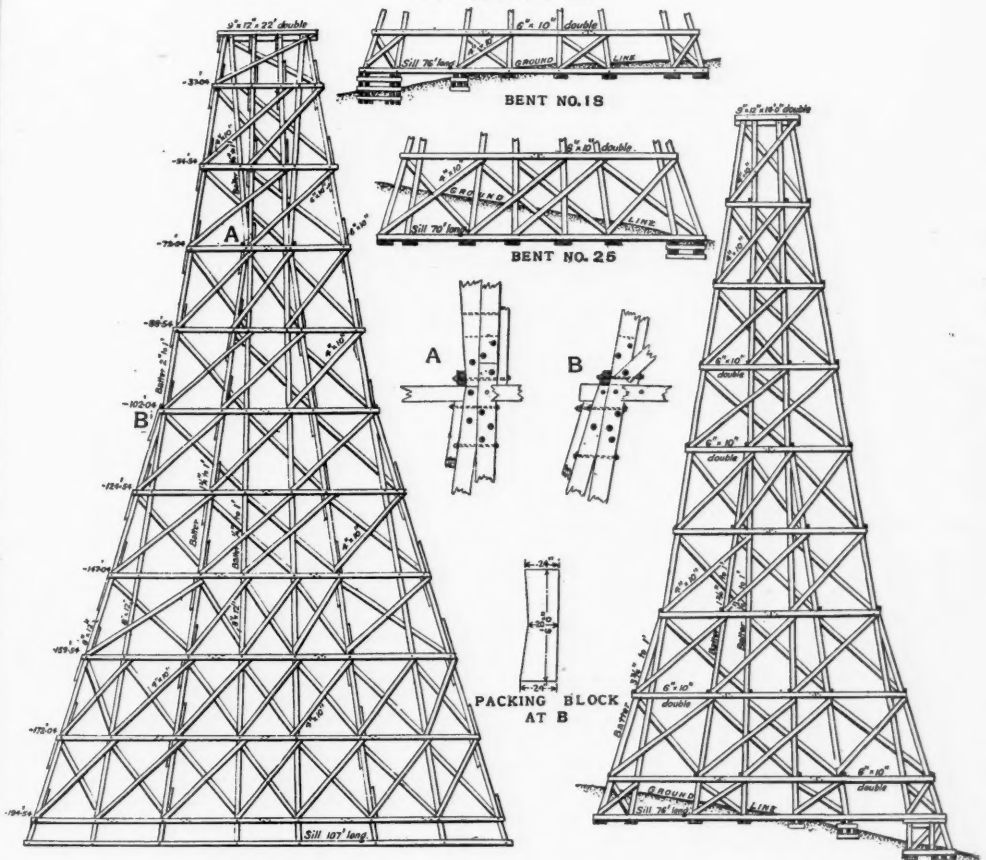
Plate VII.—Two Medicine Bridge—Great Northern Railway.
